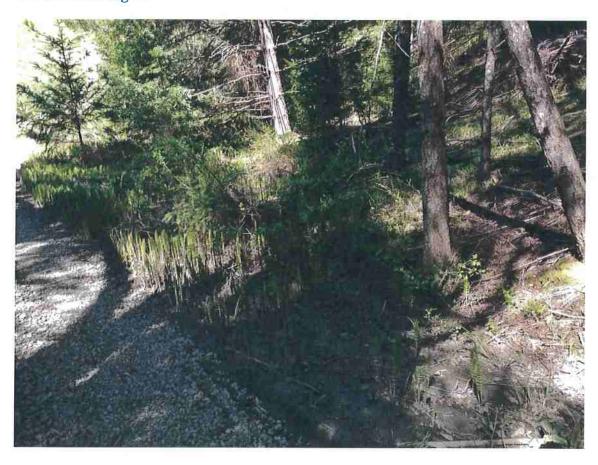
Stream Crossing #7, upslope view of springy area above inlet.
